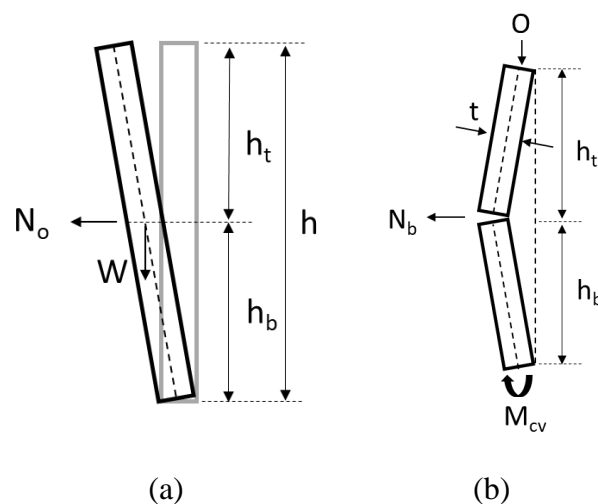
Out-of-plane failure mechanism: cantilever wall (a) and fixed-fixed boundary conditions with an applied vertical force.
